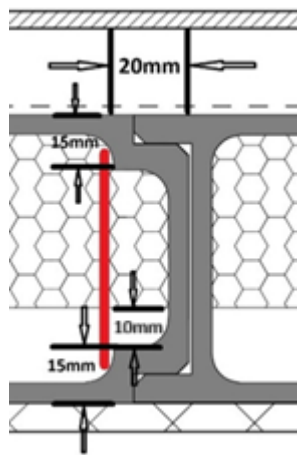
Enlarged Detail of the FRP Wall Panel Joint
